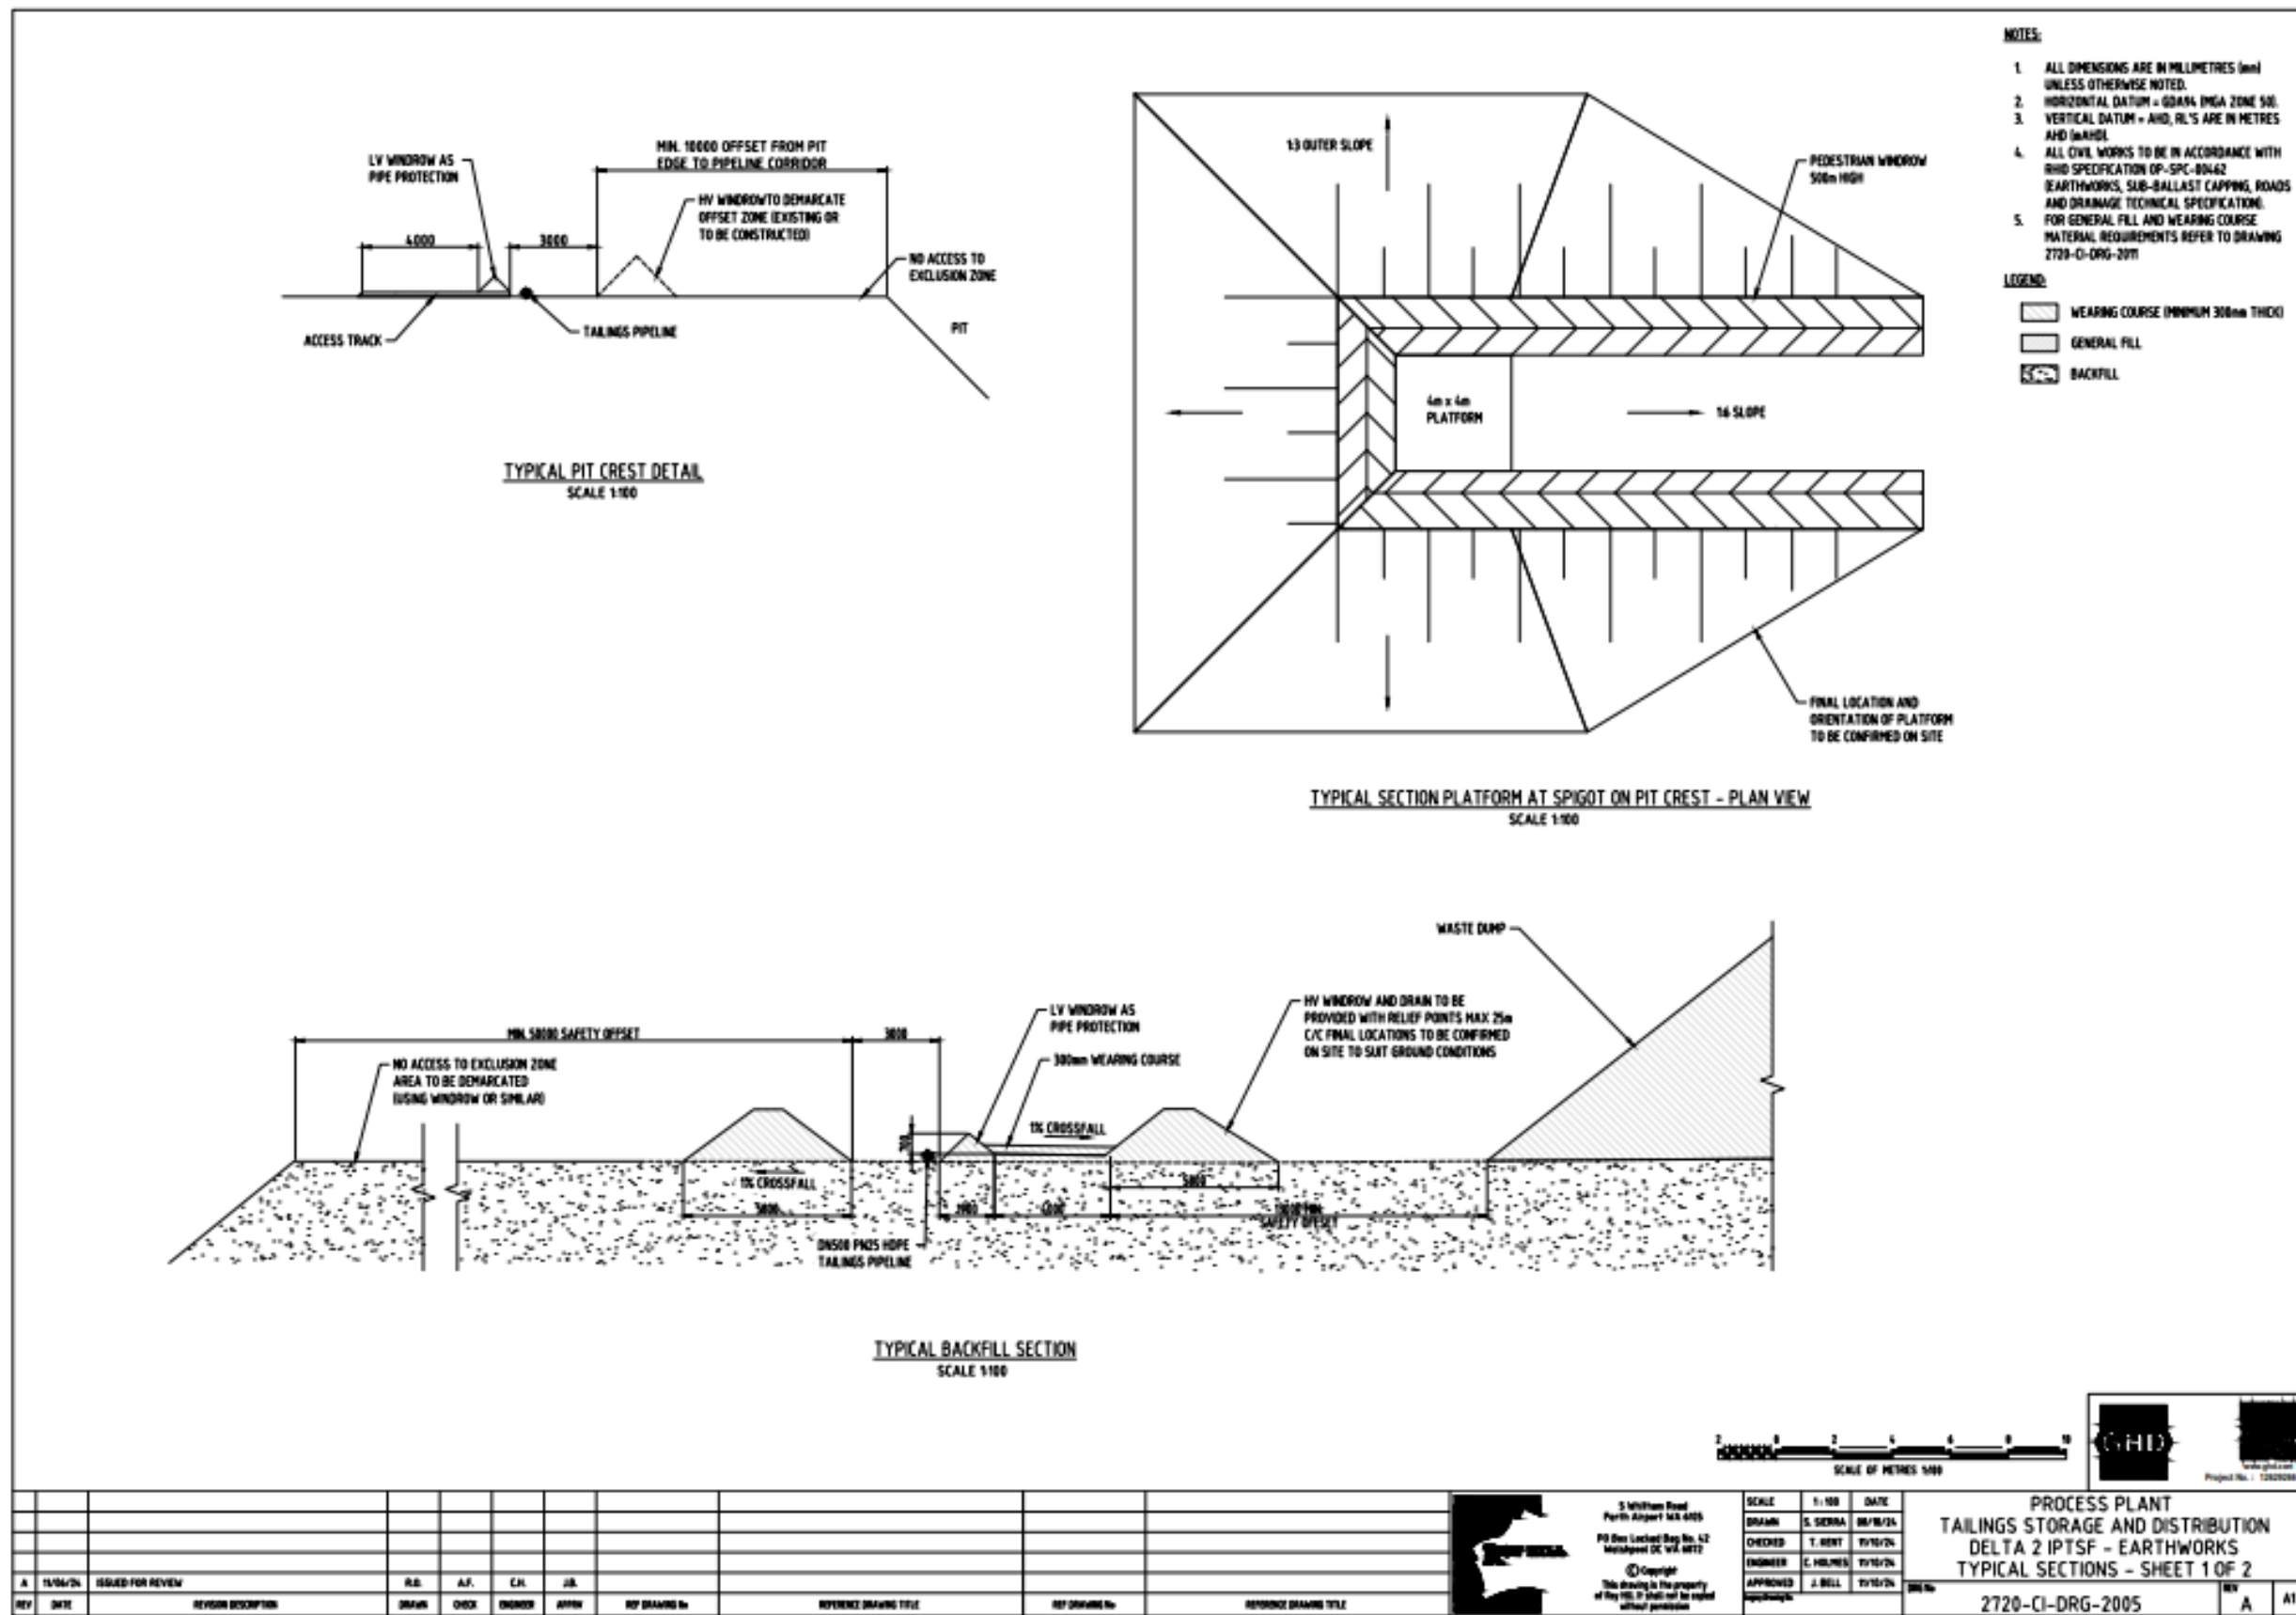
Delta 2 IPTSF – earth works typical sections for the pit crest, backfill and platform at spigot on pit crest
